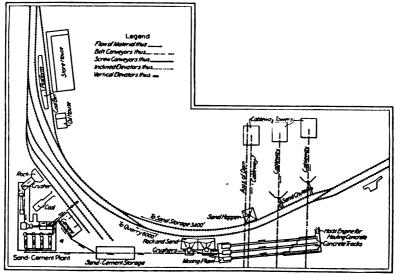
General lay-out of construction plant at Elephant Butte dam.
